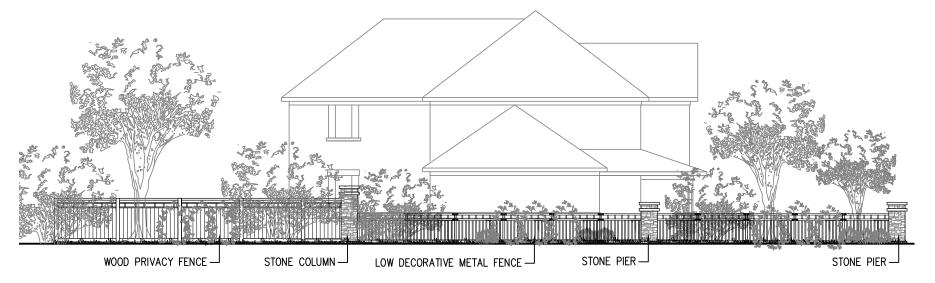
Enhanced Sideyard Adjacent to Park - Elevation
